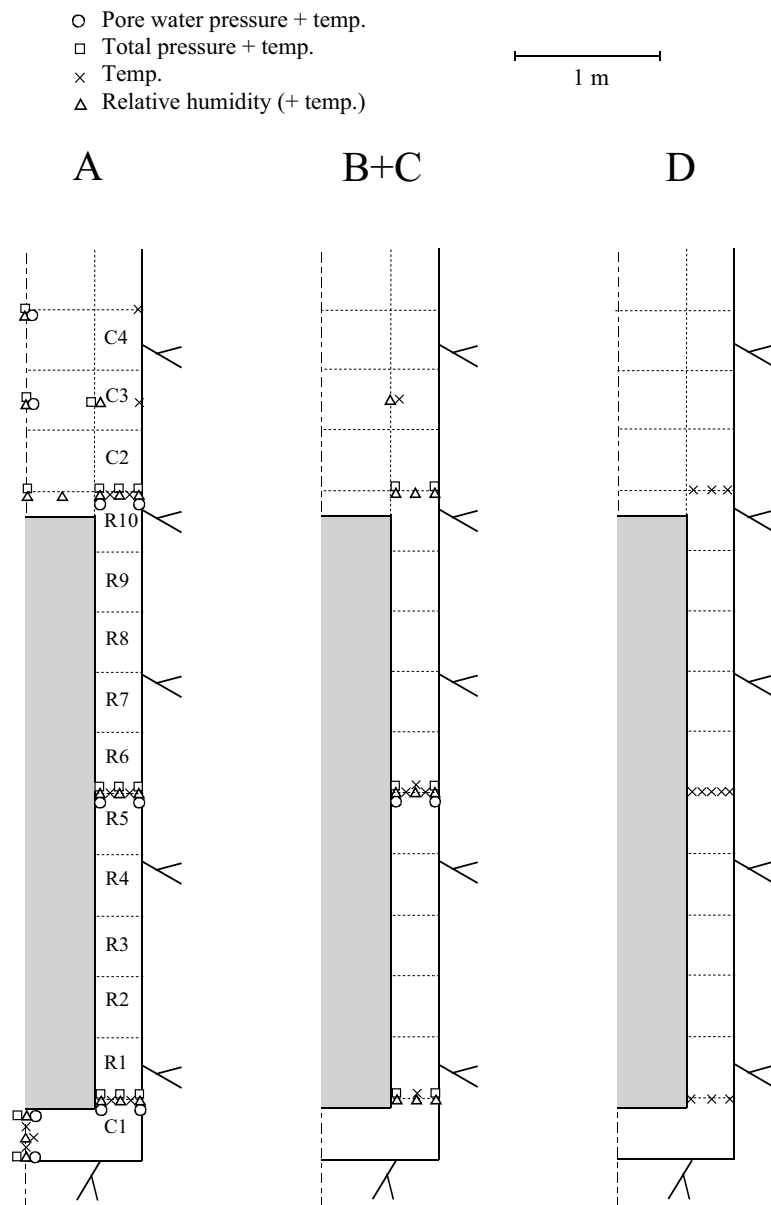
Schematic view over the instruments in four vertical sections and the block designation.
